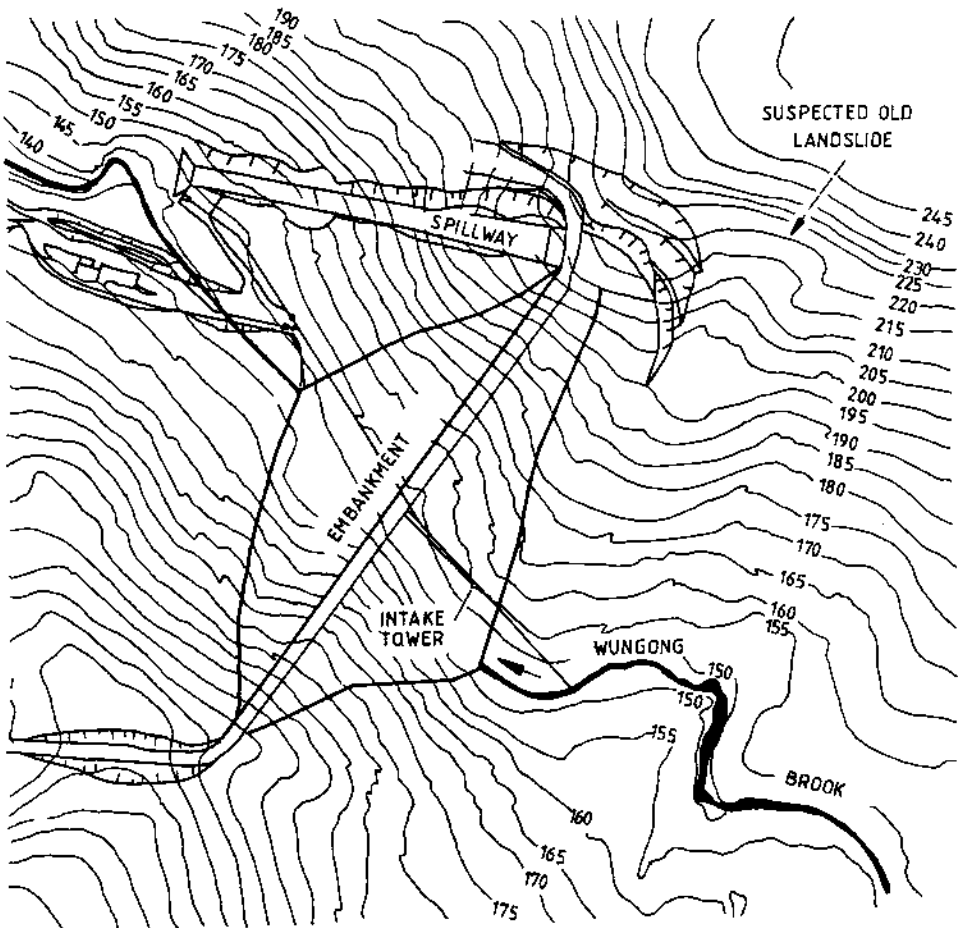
Wungong Dam, plan showing adopted layout and inferred approximate position of old landslide (from Lilly 1986).
